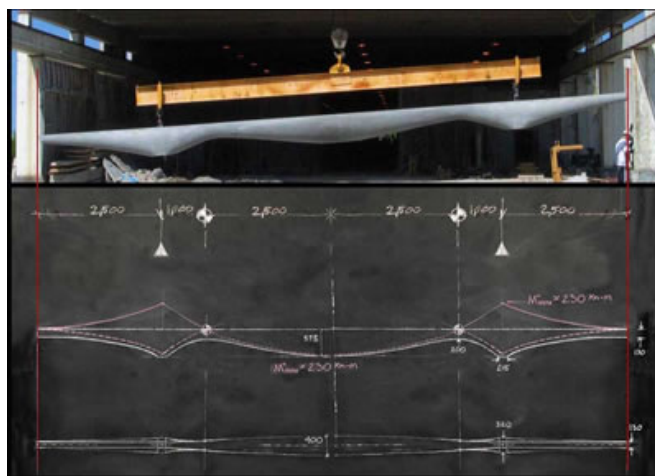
Fabric formed beam (Image courtesy: Mark West)
